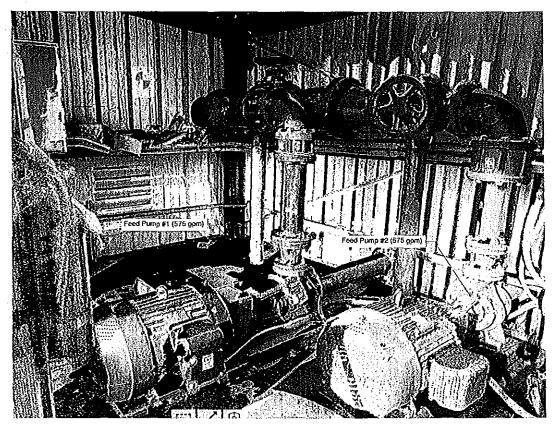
Internal View of the Ricardo pump station #2 pump room - Pump Connection Layout from ICE Survey 3D Scan, June 2025.
